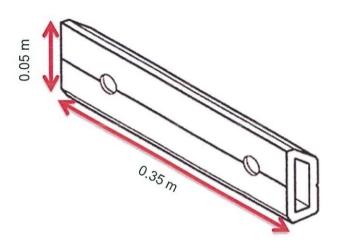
Deck Beam Bar Source: architectjaved.com (n.d)
